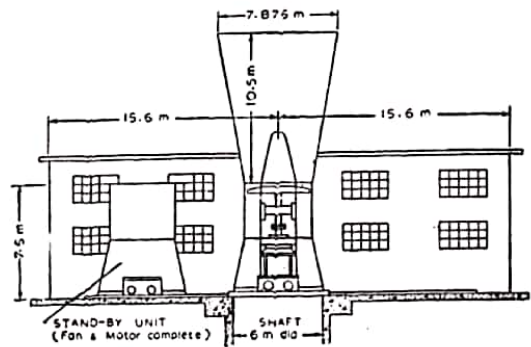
5335mm dia vertically installed fan mounted on a bogie carriage with a 535 kW direct-coupled motor (after MacFarlane).
